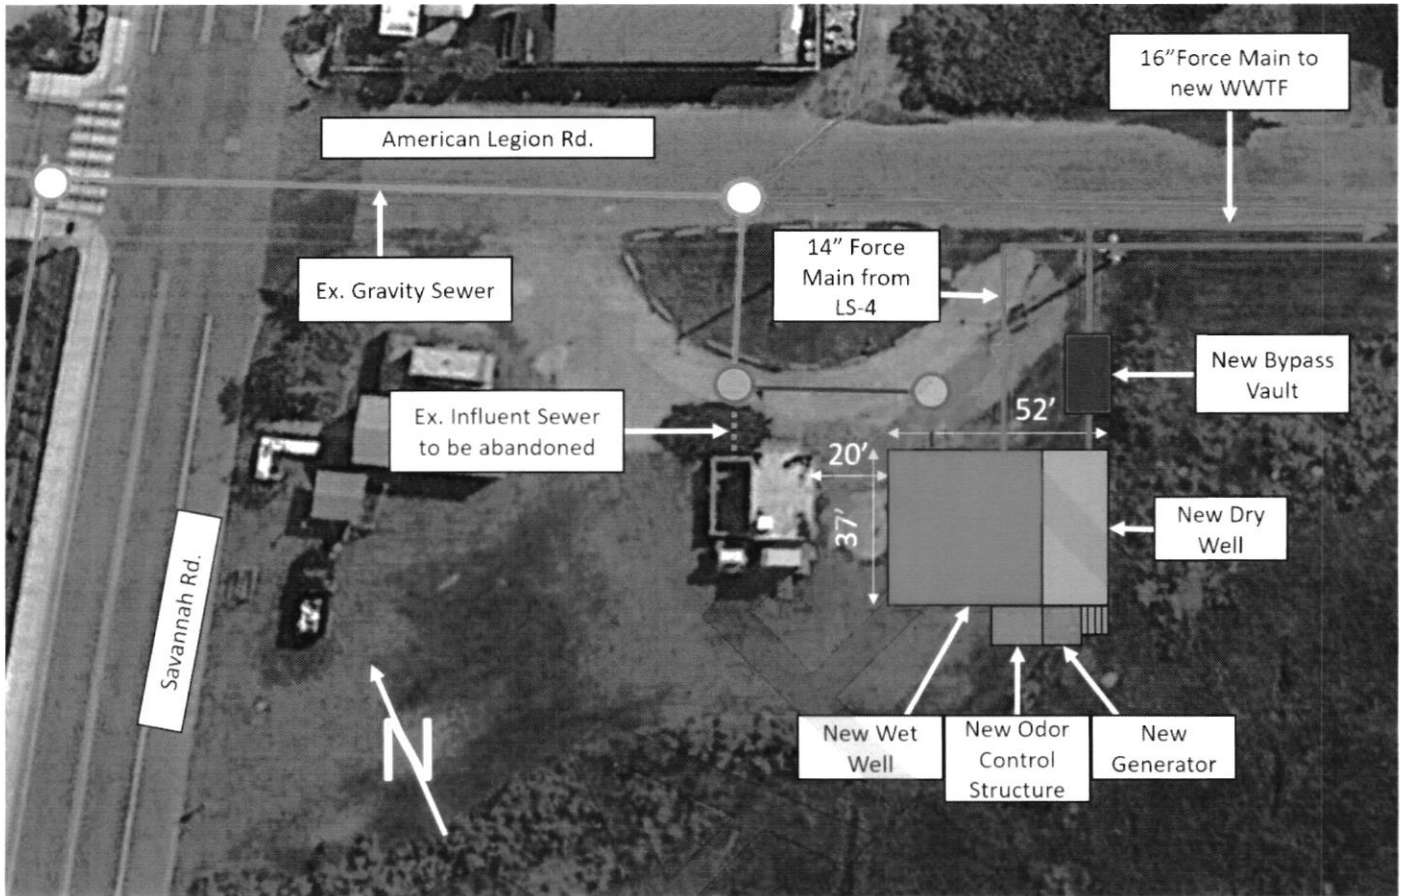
Options 2a/b/c, Raw Wastewater Pump Station, LS-8 Site Plan
